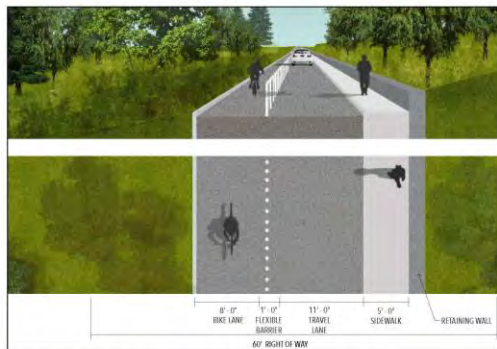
Buxton Road to NE Sandy Avenue route and sections.
